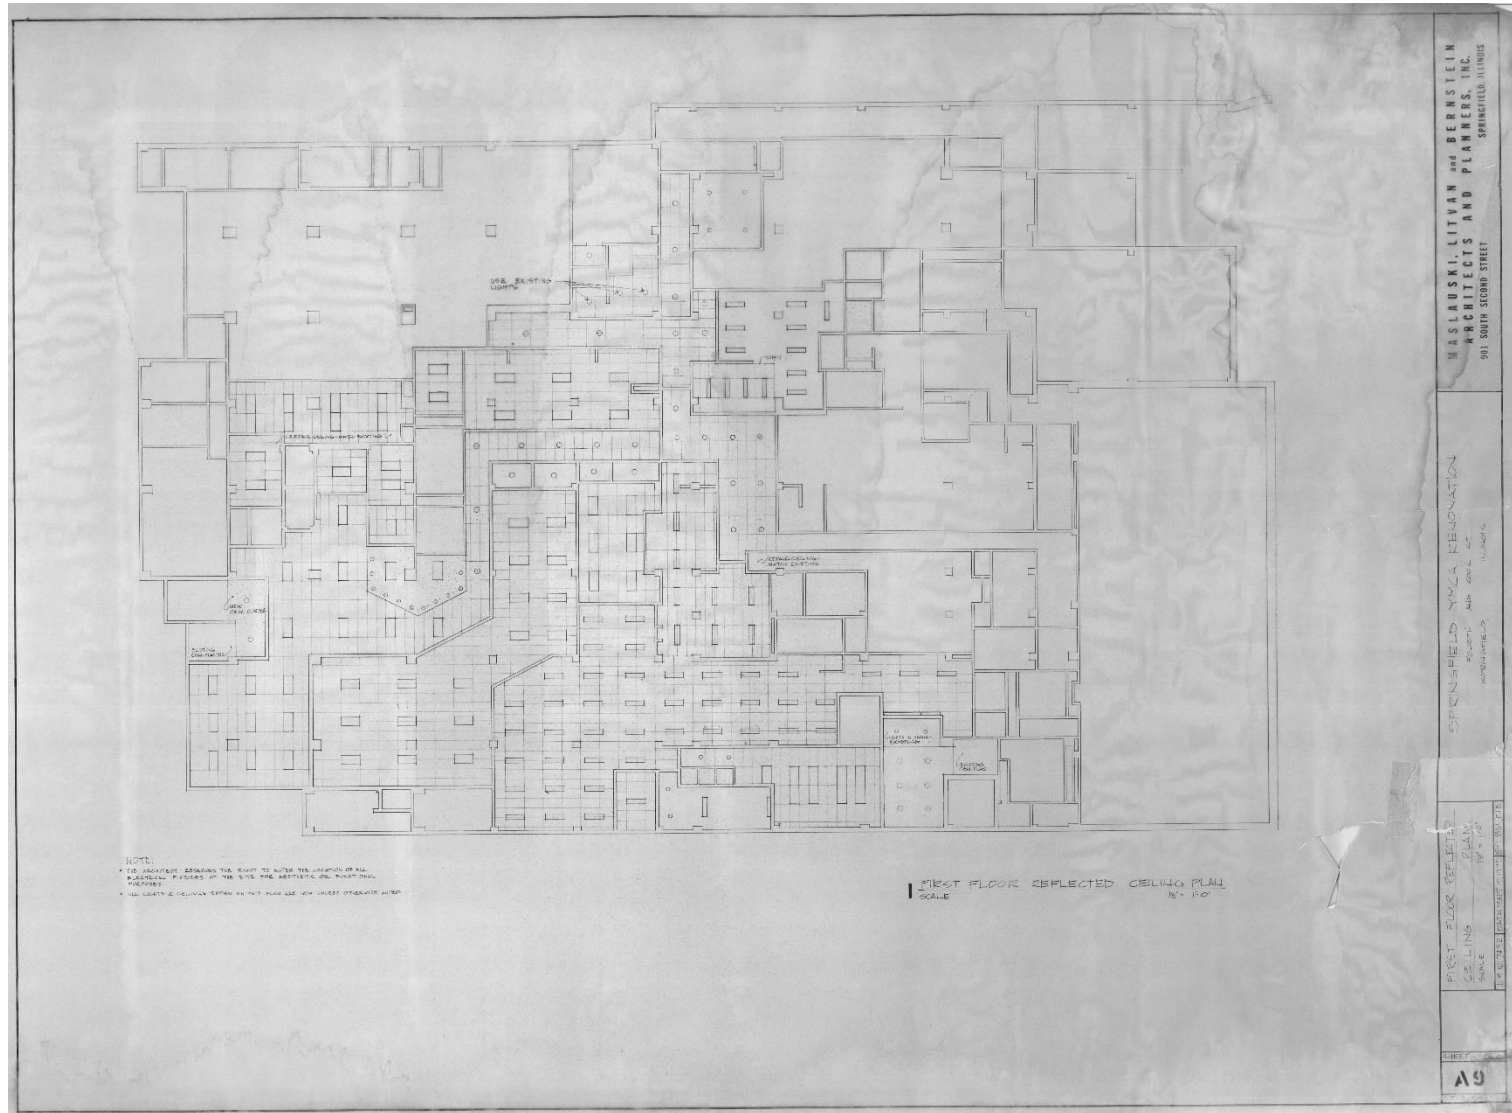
First Floor Reflected Ceiling Plan, Springfield YMCA Renovation (Maslauski, Litvan and Berstein 1975: Sheet No. A9). [December 8, 1975].
